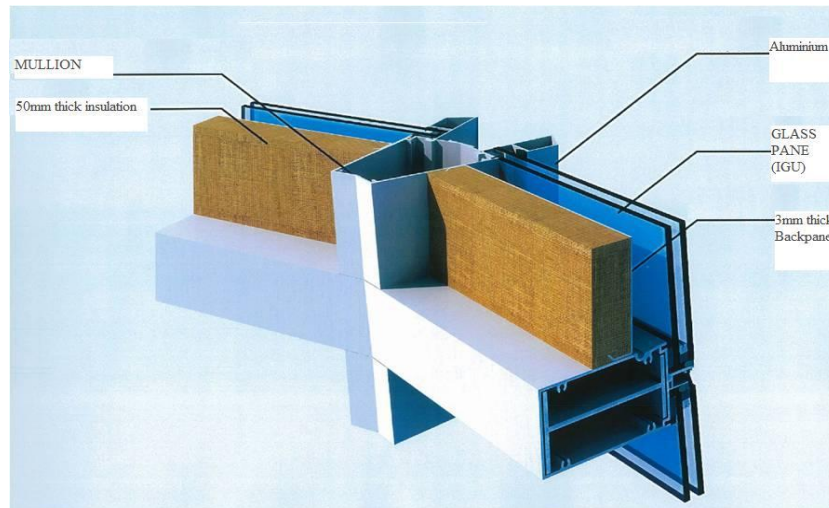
Insulation Installed in Unitized Curtain Wall System (Wong Wan Sie, 2007).
